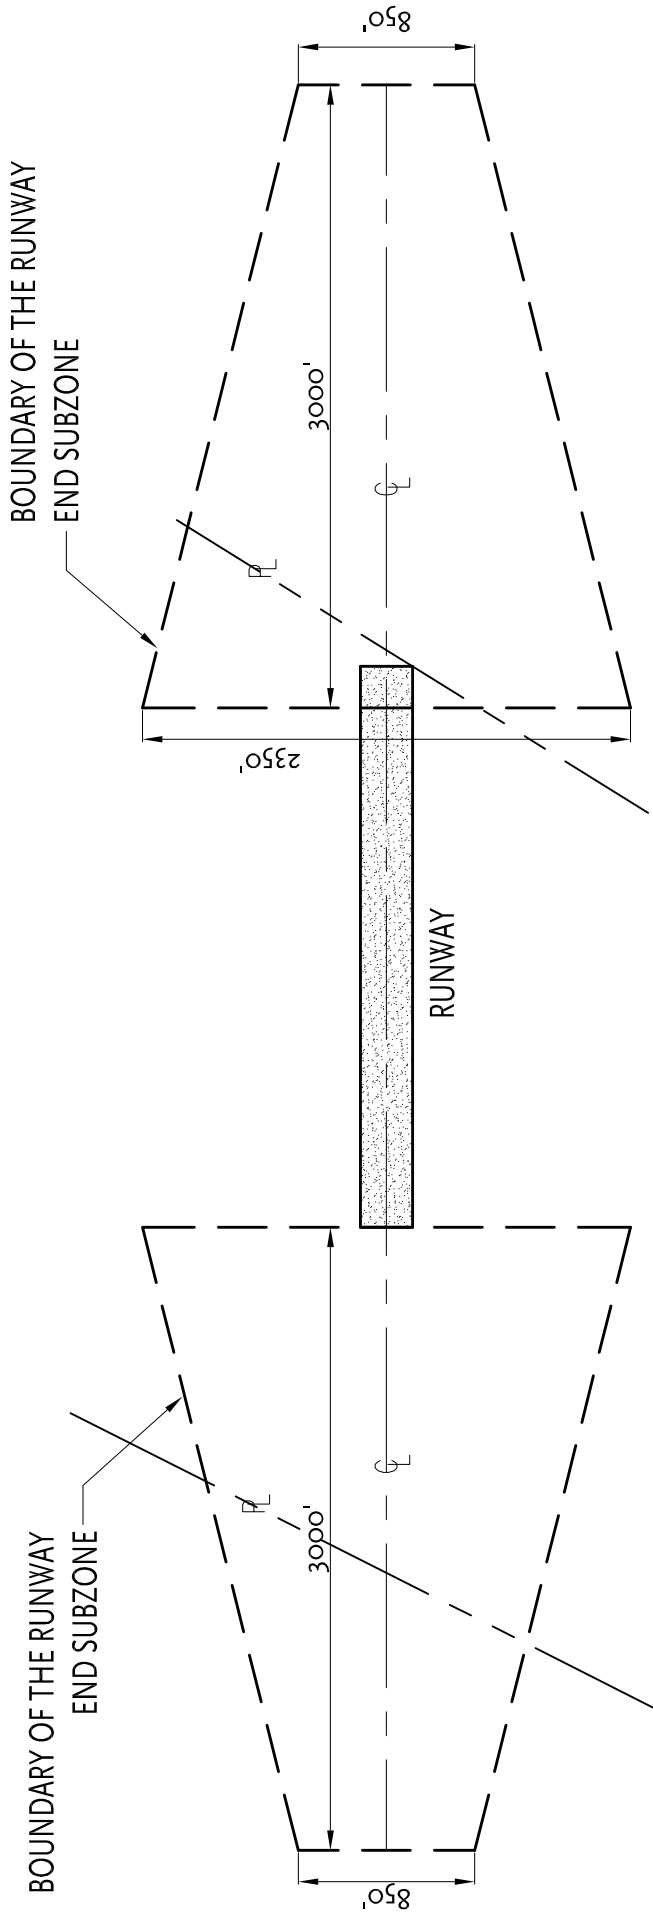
Airport Safety Zone: Runway End Subzone(s) Plan
